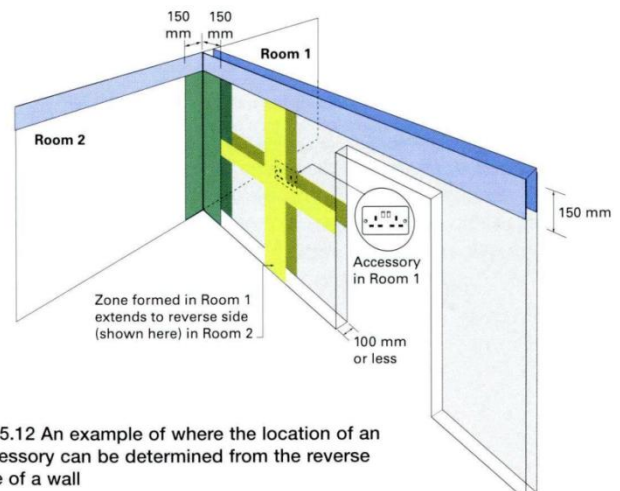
An example of where the location of an accessory can be determined from the reverse side of a wall
